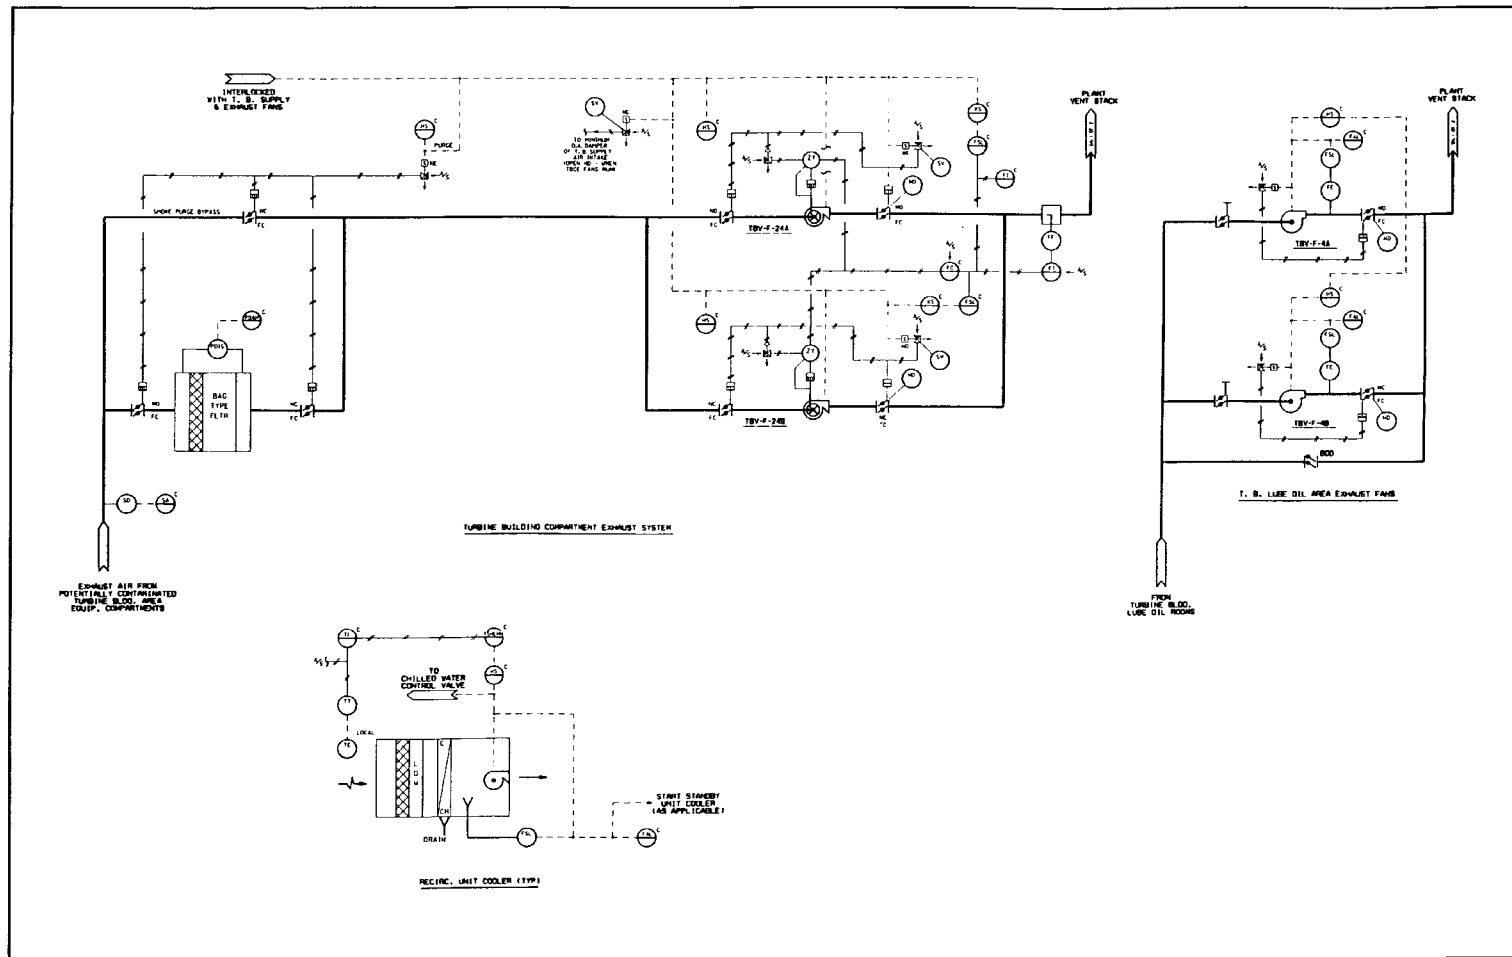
TURBINE BUILDING VENTILATION SYSTEM, CONTROL DIAGRAM, Sheet 2
